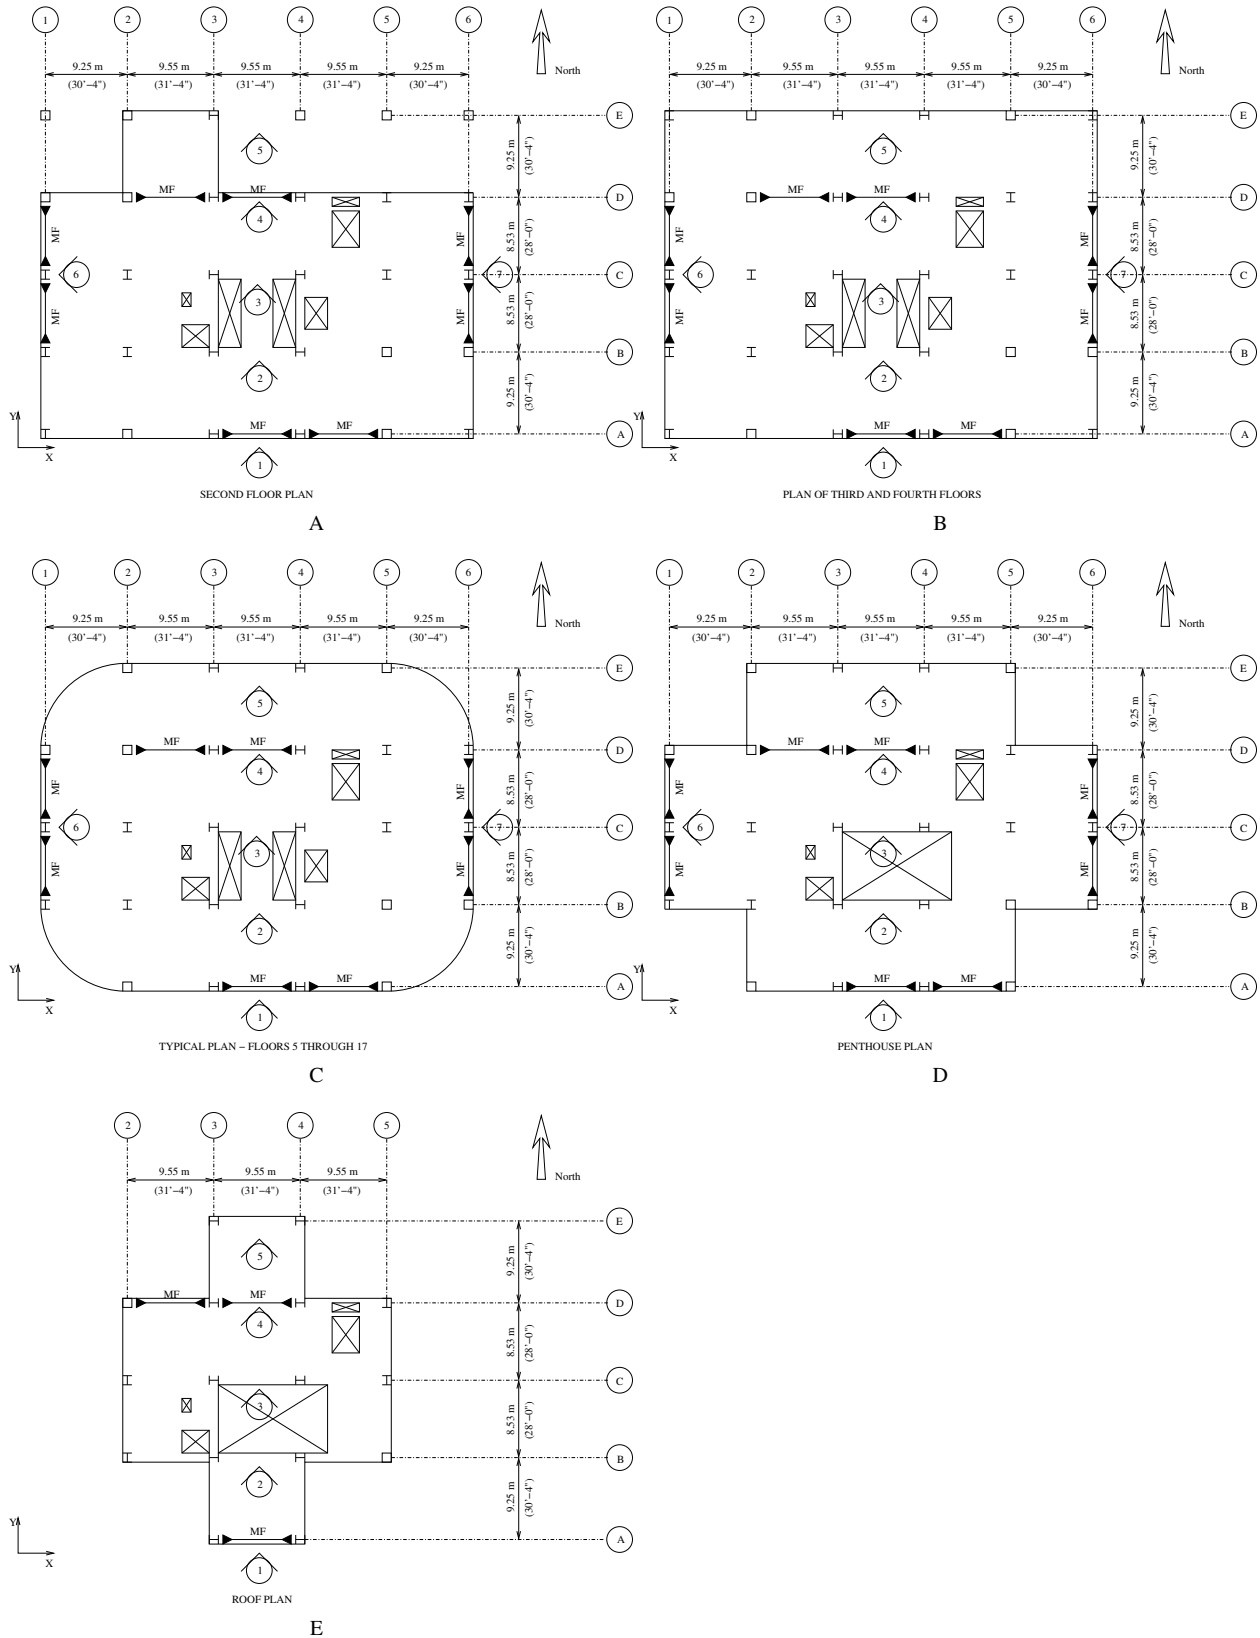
Plans of the existing building showing the location of columns and moment-frame (MF) beams (the frame elevations with beam and column sizes are given in Appendix B).
